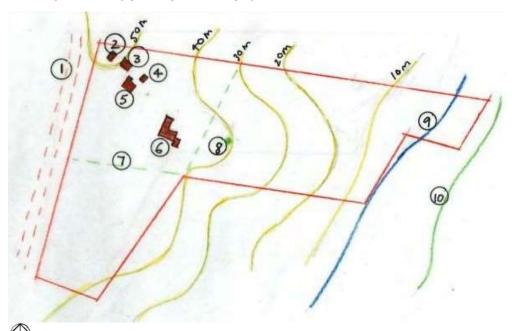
Site plan of the Mount Omei property, drawn by Geoff Ashley, 2016. Key: 1) Leacocks Lane entrance to Mount Omei 2) 1959 Garage 3) 1946 Garage/studio 4) 1960 Workshop 5) 1946 Former laboratory-gallery 6) 1947-48 House 7) Fencing around house precinct 8) Pond overlooking slopes 9) Glenfield Creek 10) Path/cycleway (Ashley, 2016, p25 and Annexure A).
